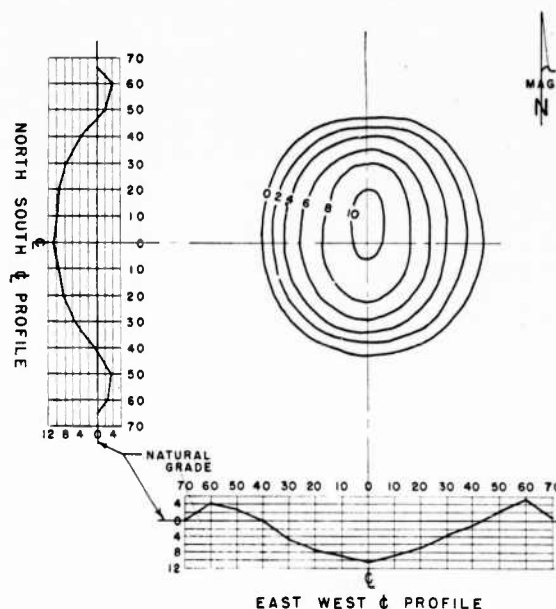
Crater plan and profiles, revetment 2, Test 6.
